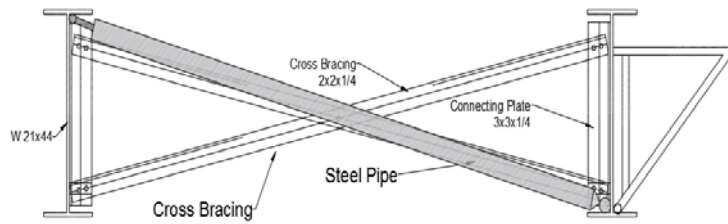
Cross section with transverse tie + horizontal pipe (TT + DP).
